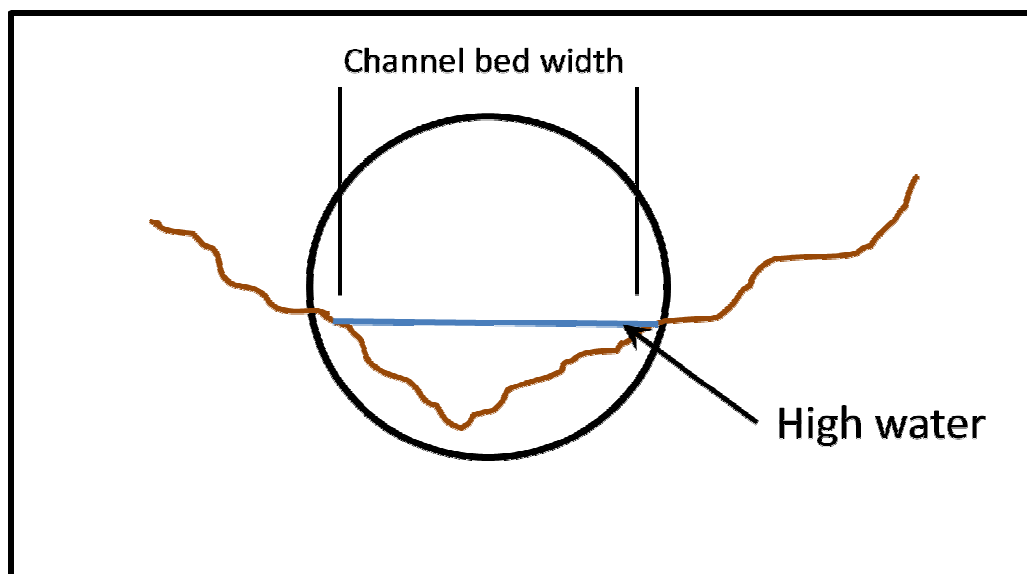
Cross-section of a pipe culvert showing the 'channel bed width'.
